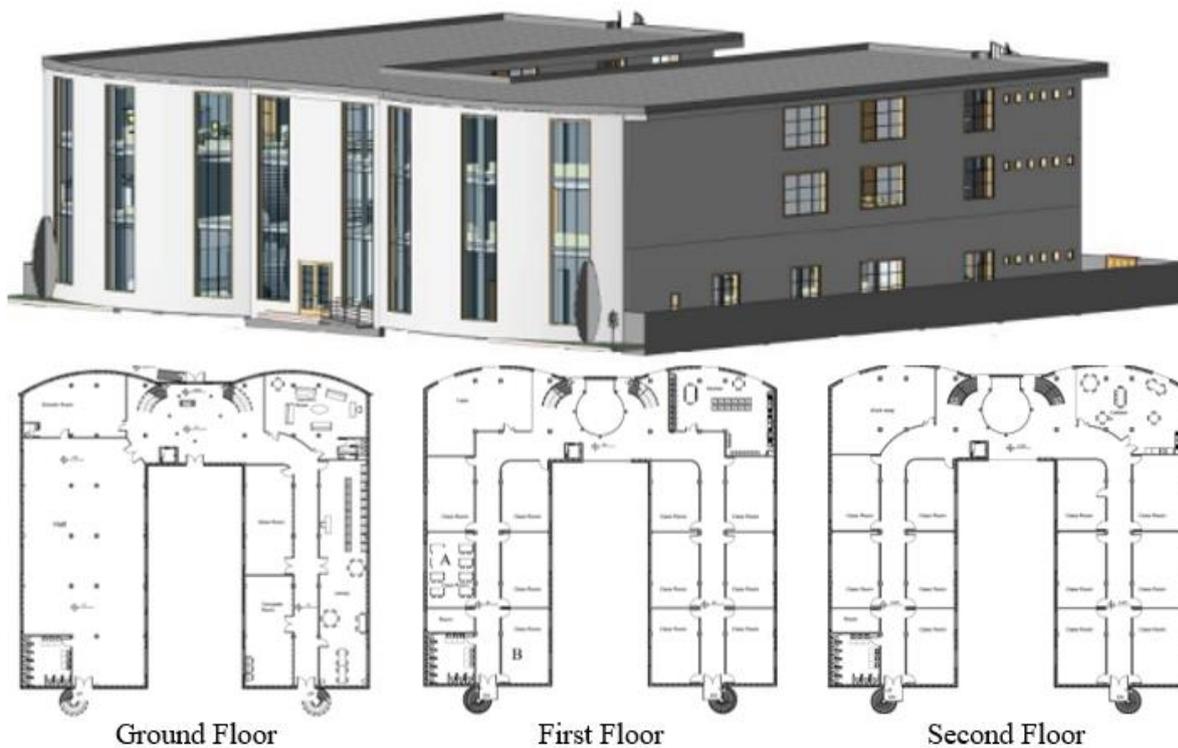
3D Model and the floor plans of the school building (Najib, 2019)
